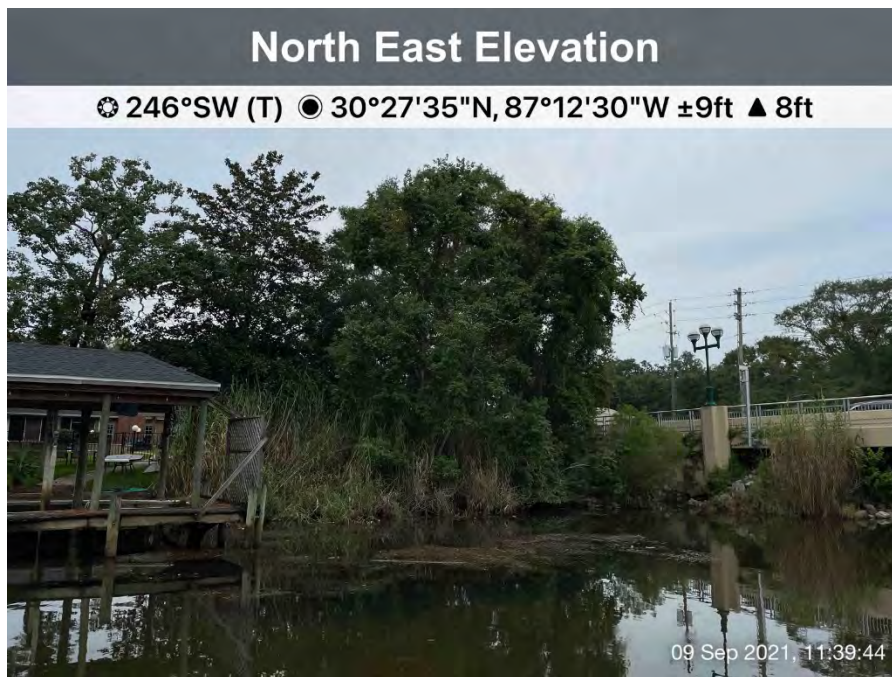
Taken just east of 4150 Menendez Drive looking north at 12th Ave bridge.
